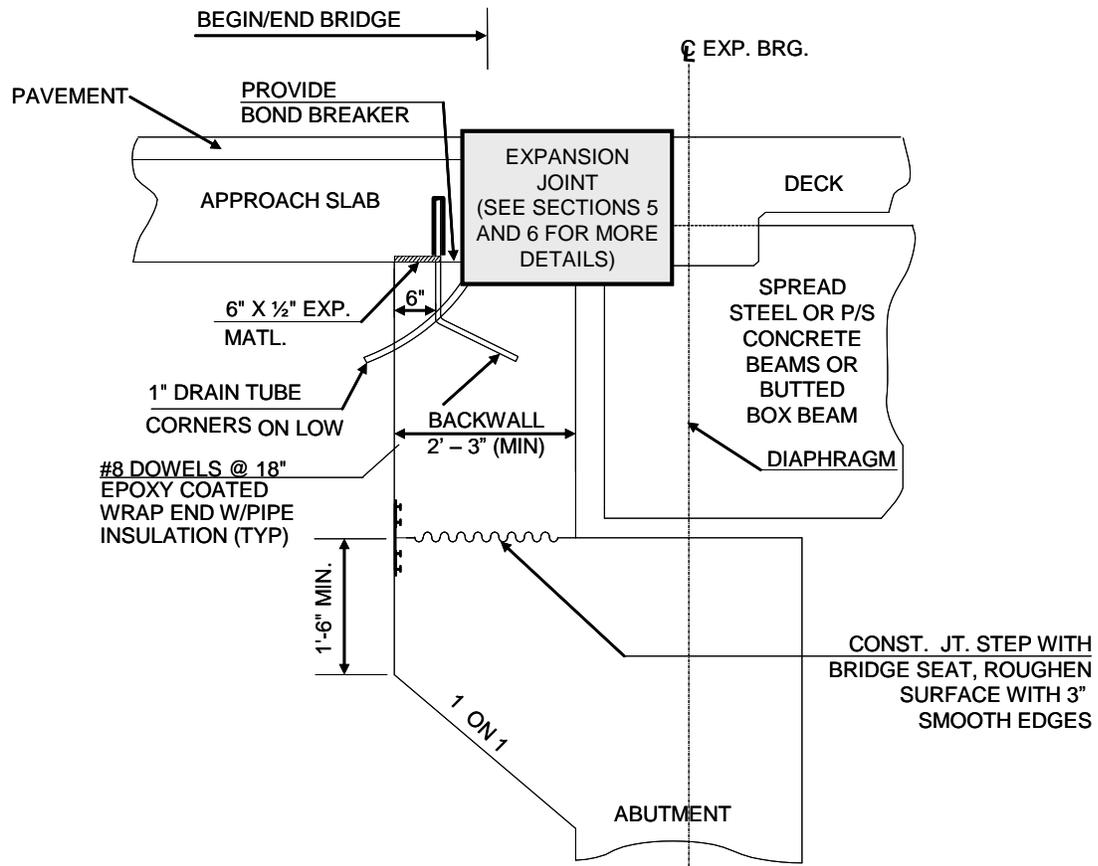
1 Type H – Bridge End for Long Spans with Spread Beam Decking or Intermediate Spans with Butted Box Beams decking, both with Approach Slabs.
